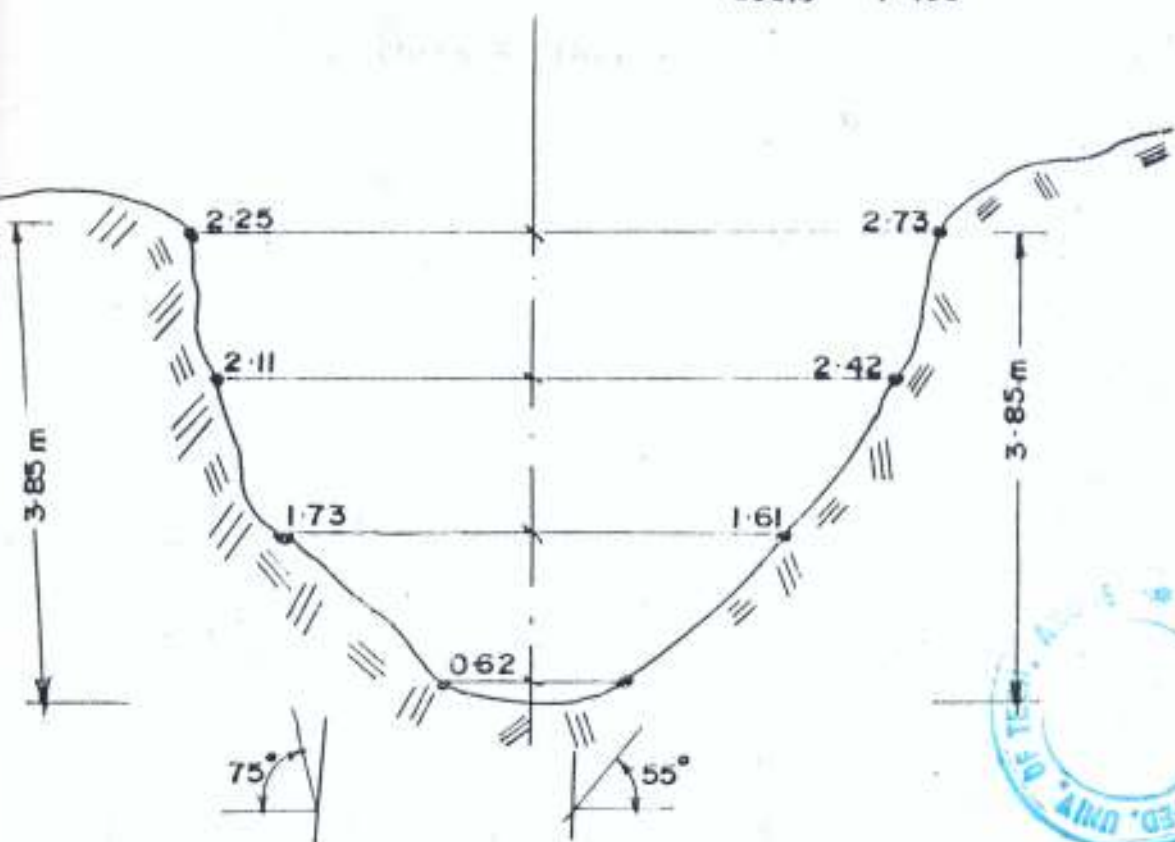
TYPICAL CROSS SECTION OF ISAIIA GULLY
